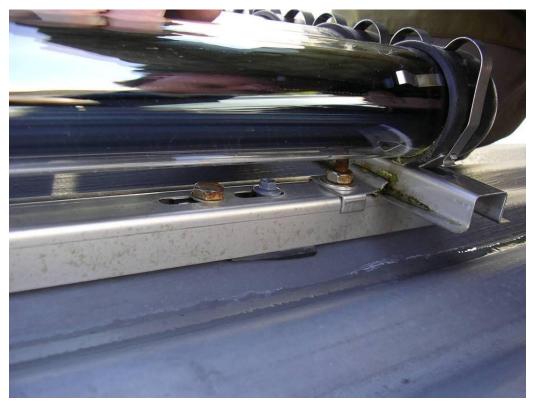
Separator under stainless steel channel – rust on stainless steel bolts is manufacturing fault.
